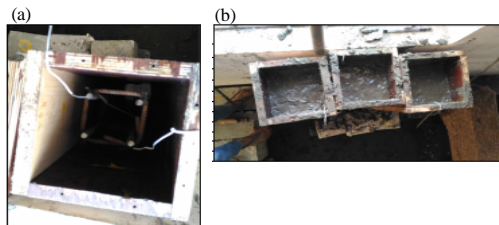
a, b) Reinforcement, strain gauge positions and casting of specimens
